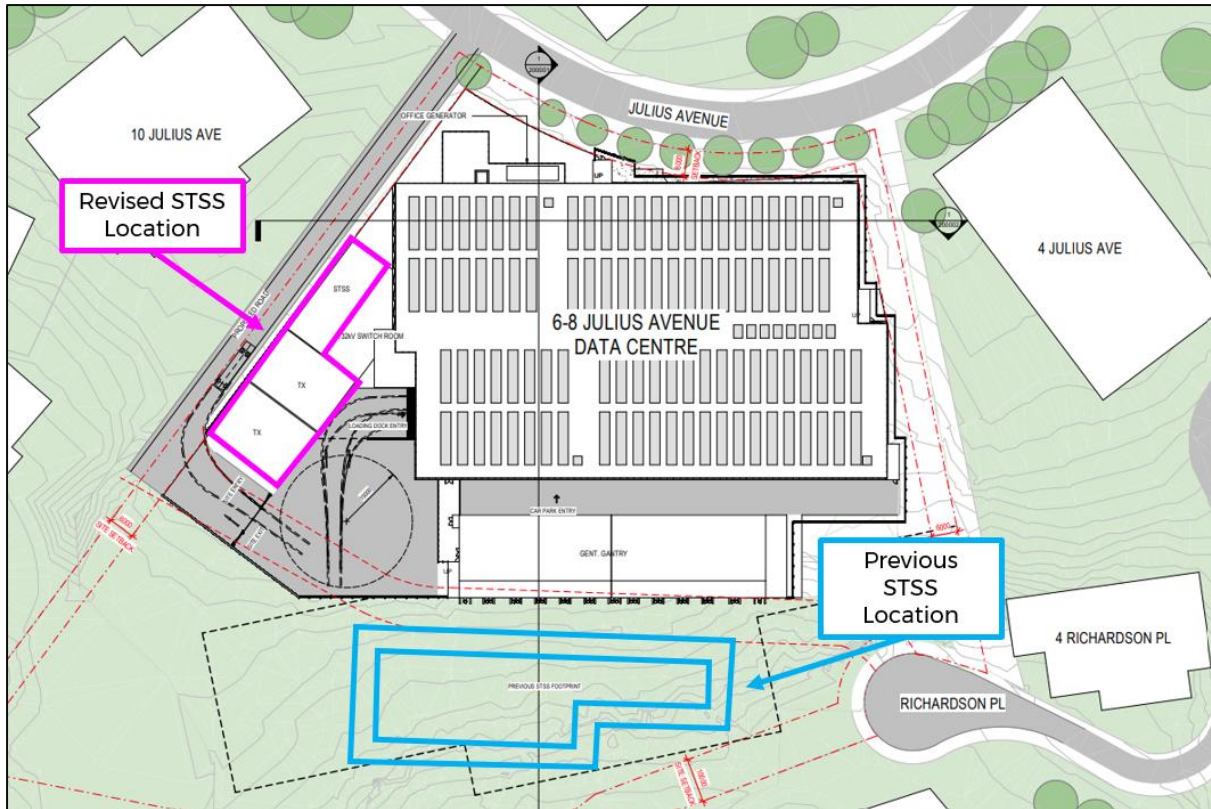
Location of STSS (Source: Greenbox Architects, 2025)
